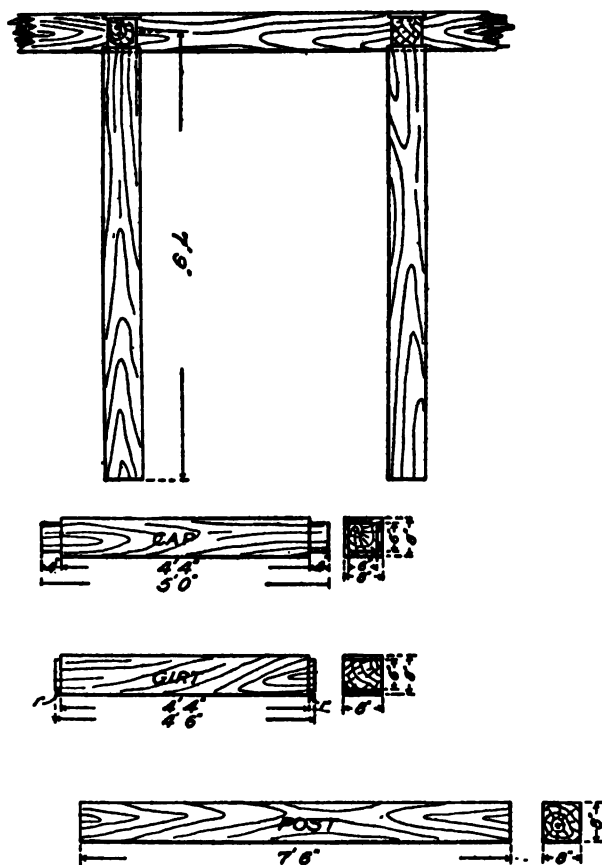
SQUARE SET. 8-IN. TIMBERS. SIDE ELEVATION AND DETAILS.
